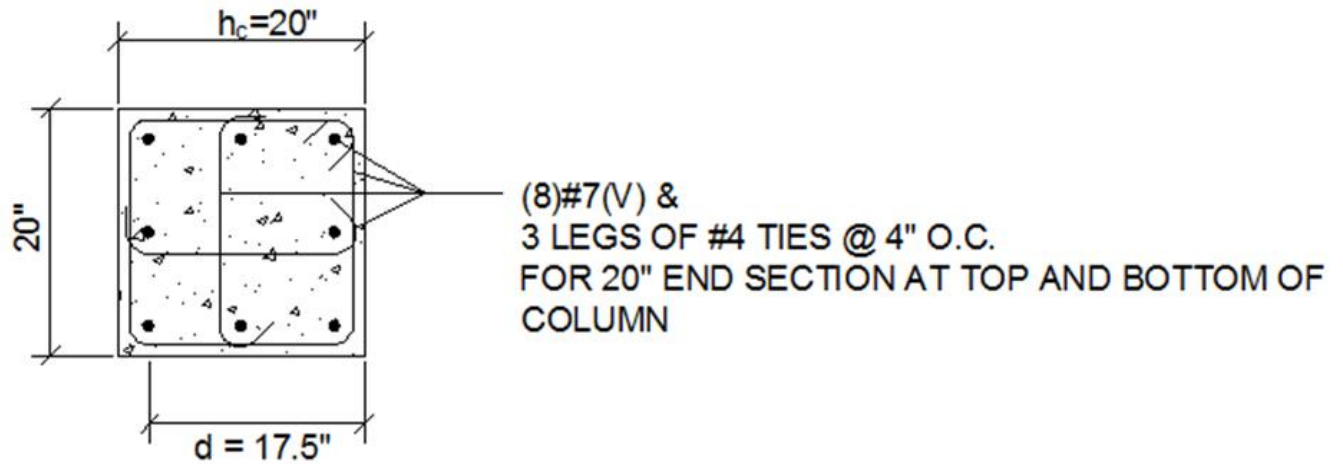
Exterior column, cross-section at end of column at all floor levels based on SDC D design.
